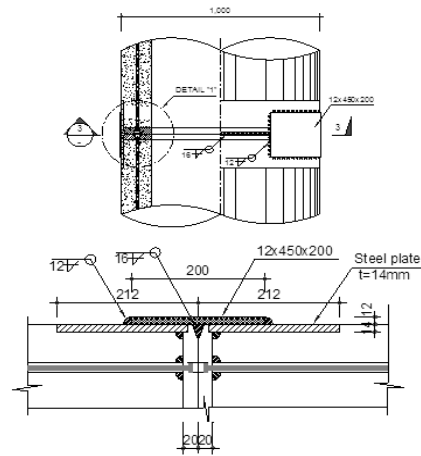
Welded Joint Details for PHC Pile(D1000)
